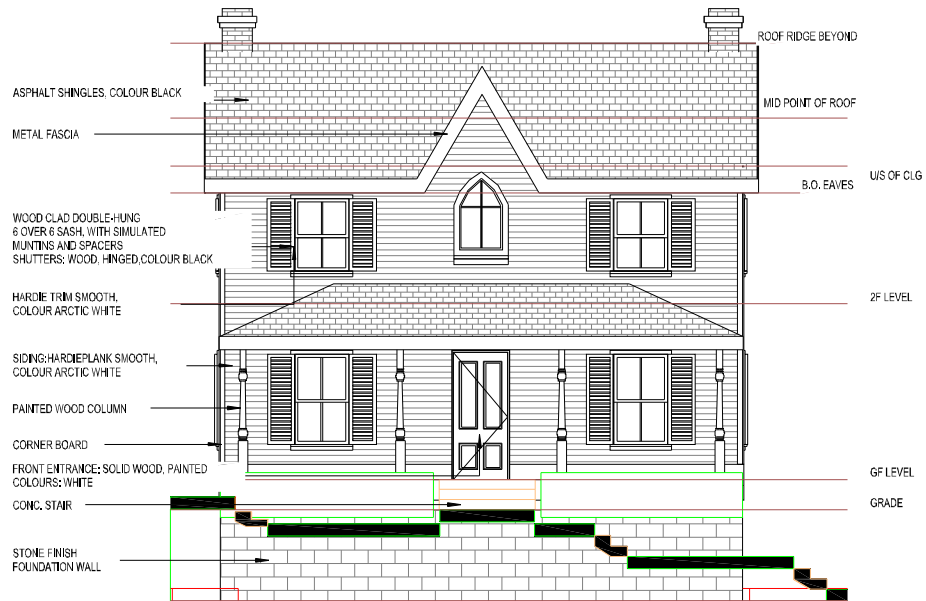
Proposed front (north) elevation for No. 99 Nashville Road.
